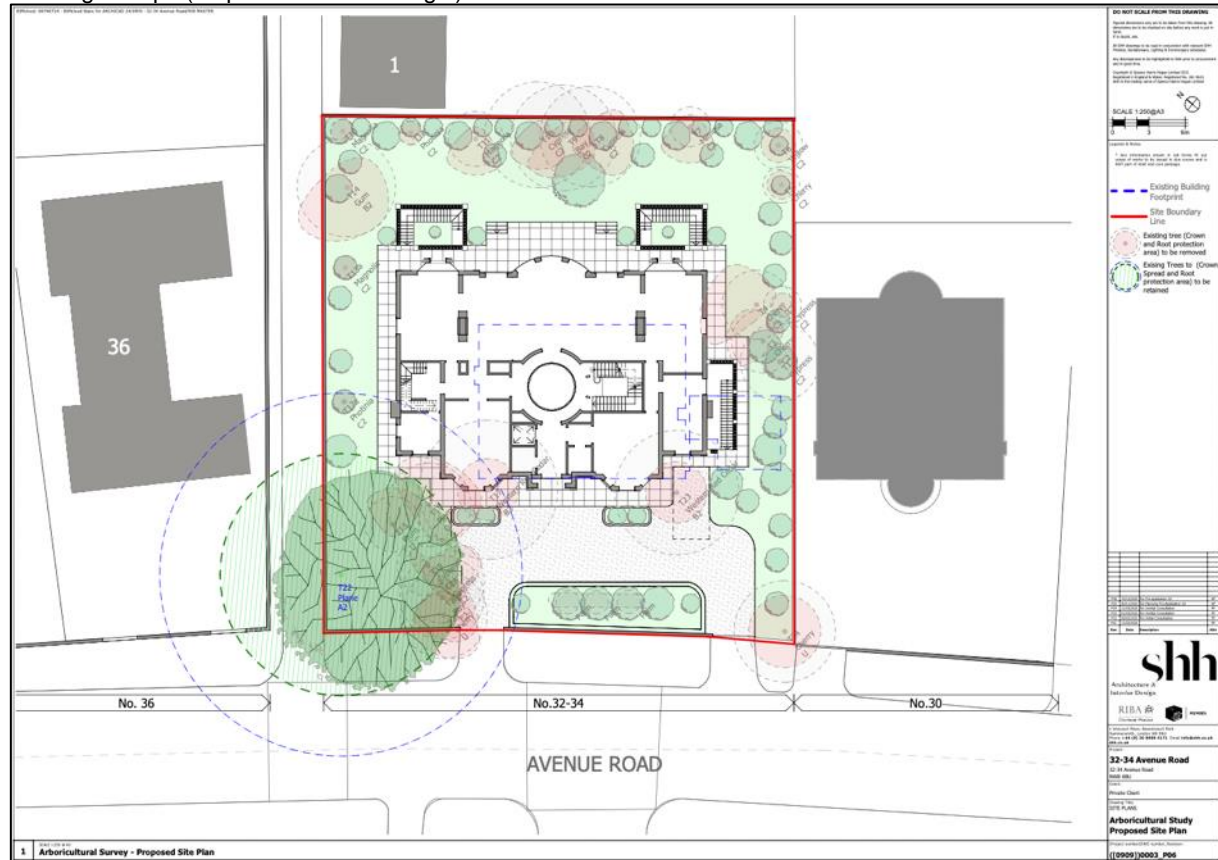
A proposed layout plan of the development at 32 -34 Avenue Road, London. Reproduced courtesy of SHH Architecture & Interior Design (Drawing No. ([0909]0003_P06).
